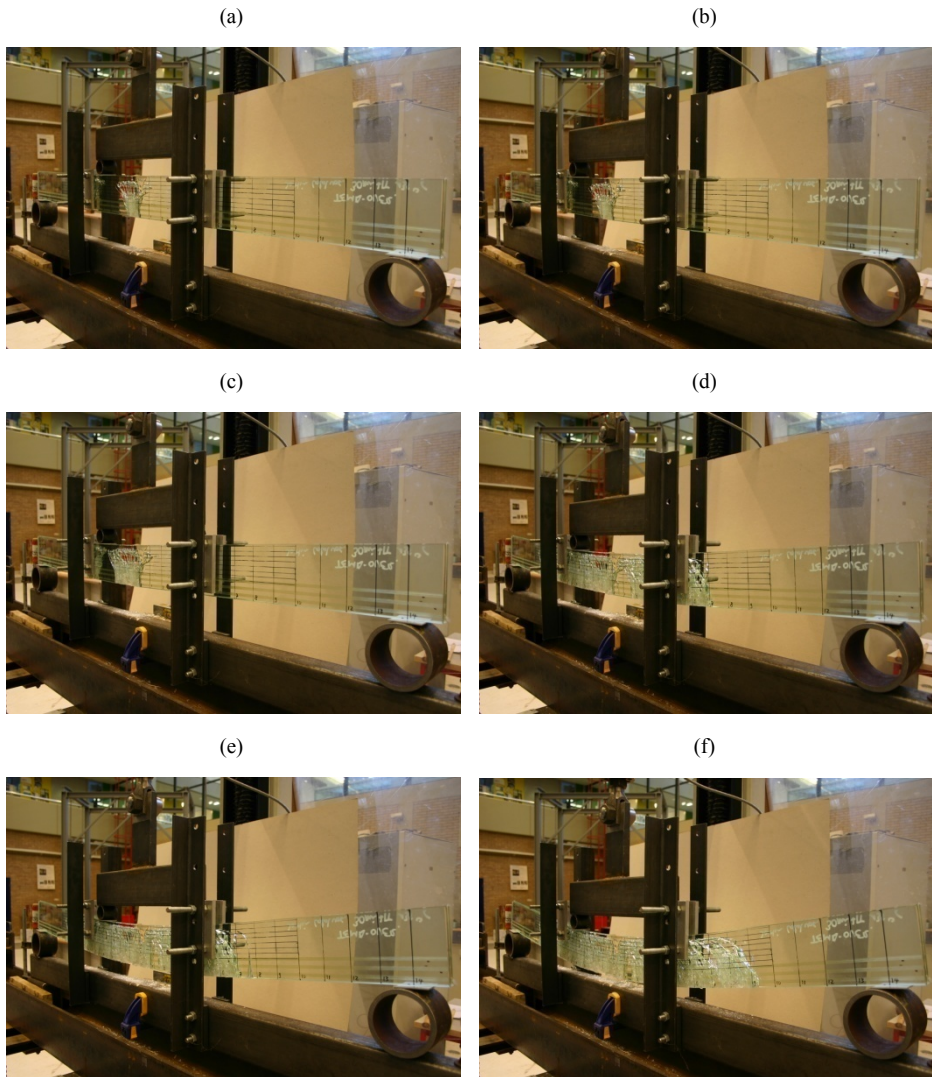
Photo sequence of an exemplary bending test on a 1.5 m SG-laminated GFRP-reinforced glass beam, with flat reinforcement rods.
